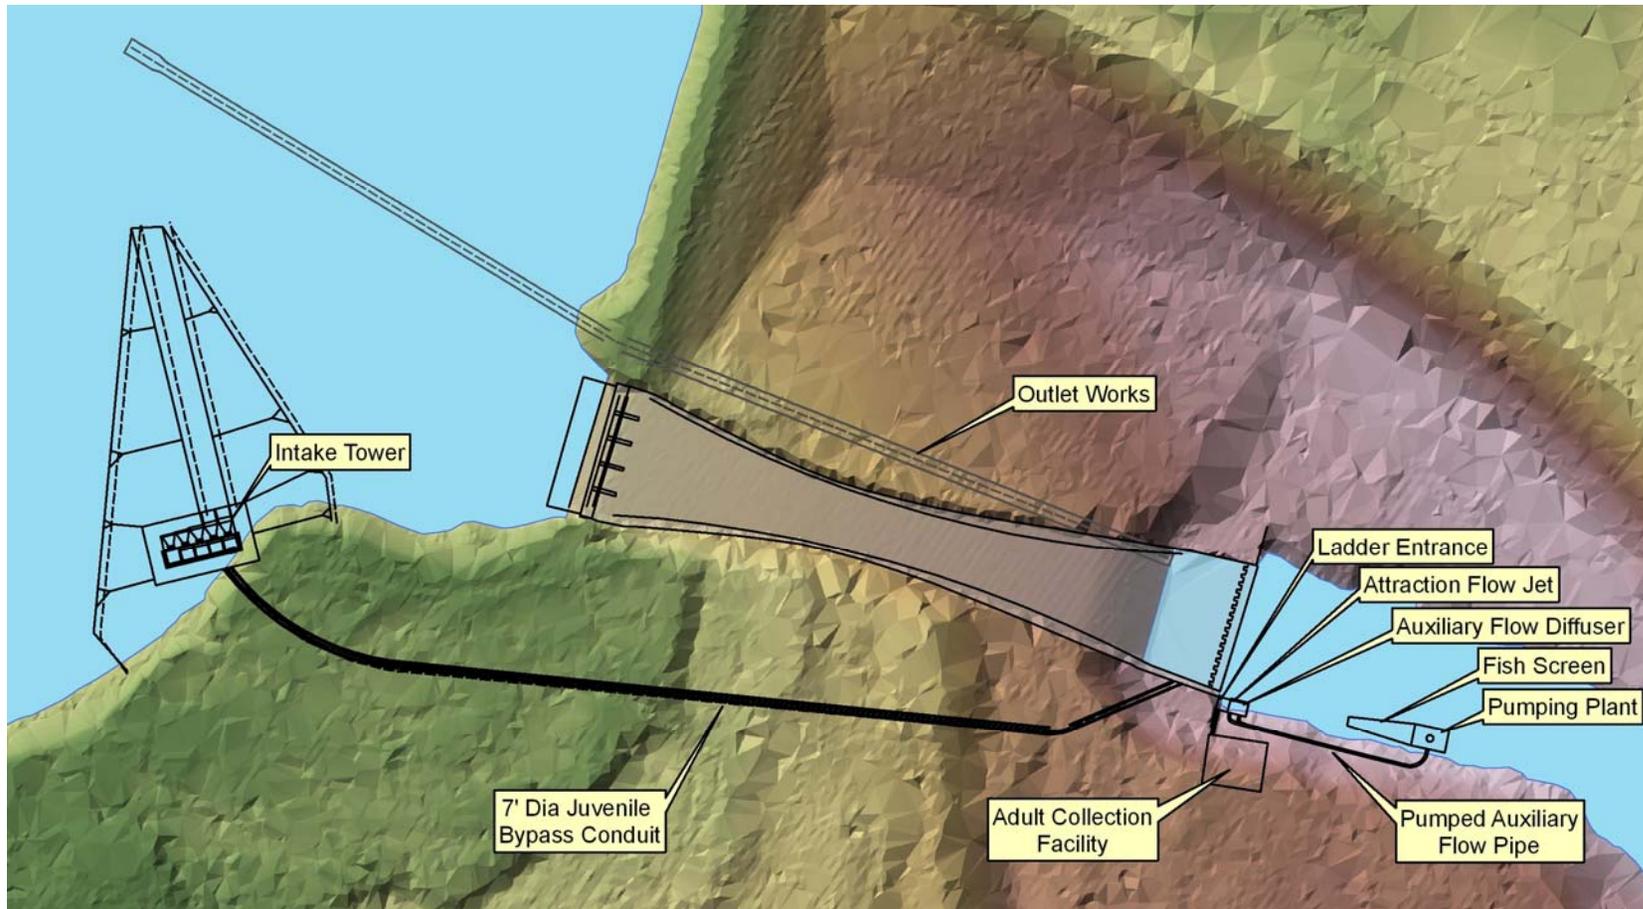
Preliminary rough layout of the VP proposal for the right bank upstream trap and haul and downstream passage exit facility with the removal of the juvenile tagging facility.
